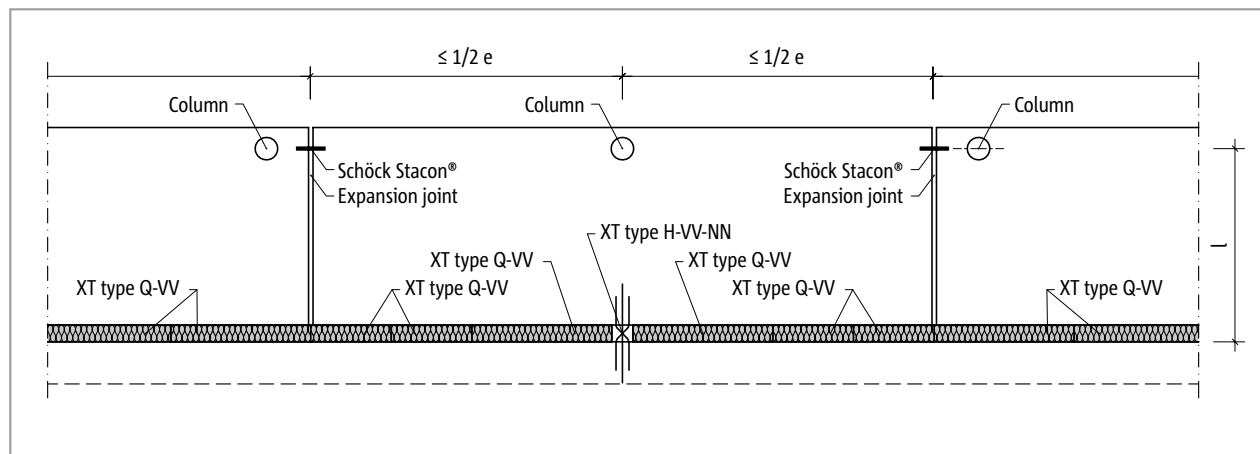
Schöck Isokorb® XT type H: Expansion joint arrangement
